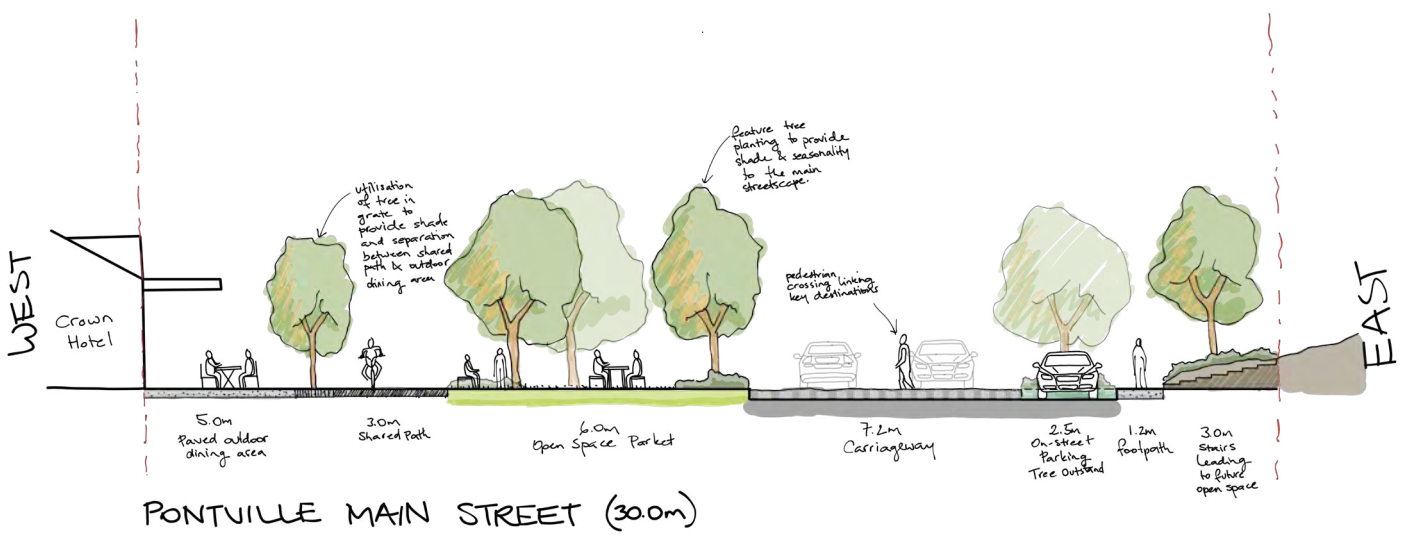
Section E – Pontville – Brighton Road – Town Centre – Main Street
